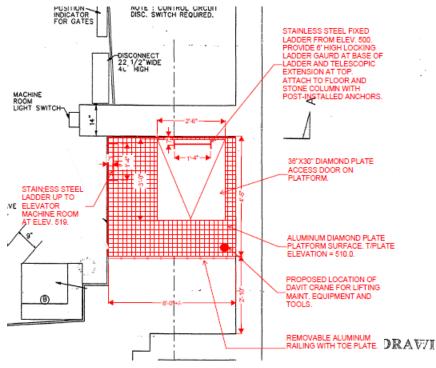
Draft Partial Plan of Proposed Platform for Access to the Elevator Machine Room
